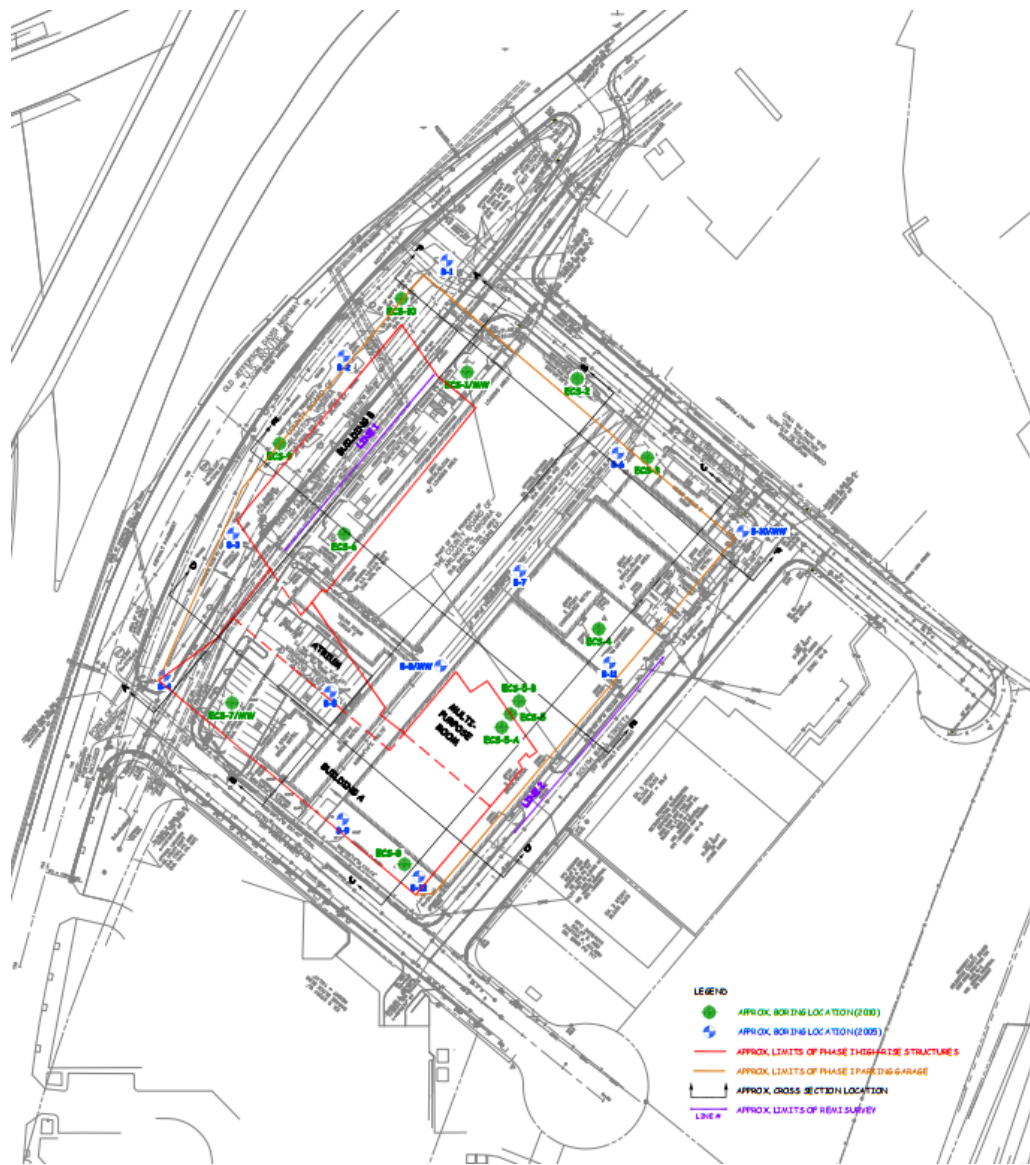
Geotechnical Boring Hole Locations (Drawing Underlay Courtesy of Gensler)
